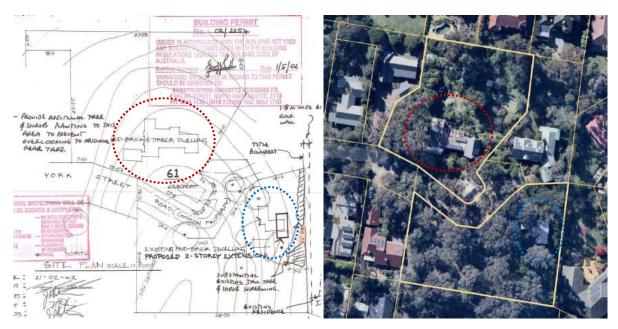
Site plan prepared in 2002, showing the structures of interest (left), and the aerial view of the subject site, with the site boundary outlined in thicker yellow lines (right). Note the house comprising 1948, c1948 and 1959 sections (outlined in red) and a freestanding 1950 pottery now converted to a house (blue). (Source: BP 02/2254; Nearmap 2021)
